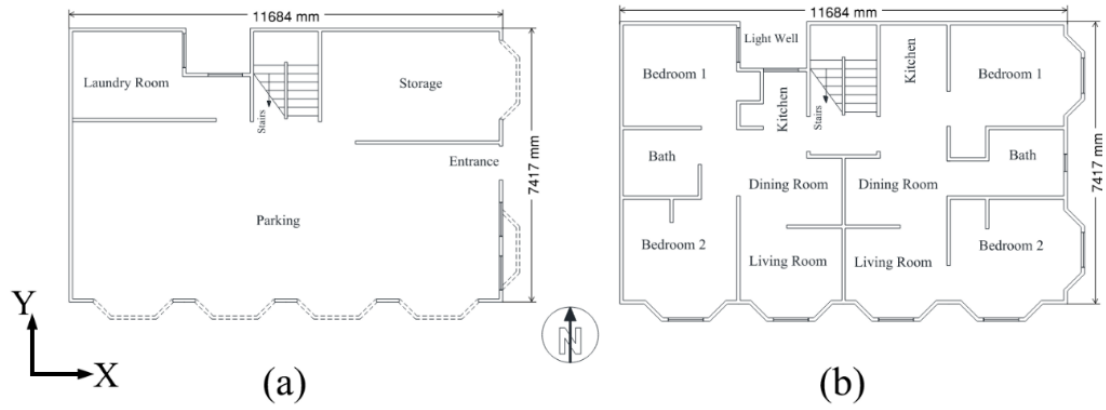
Floor plans of the four-story wood framed prototype building [4]:
